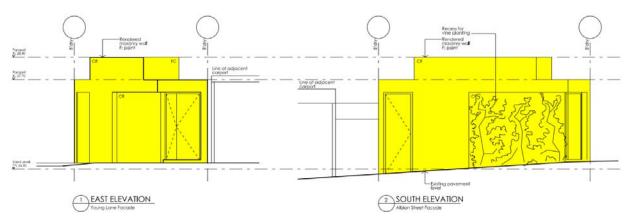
Proposed East (Young Lane) and South (Albion Street) Elevations at 7 Young Street Annandale.
